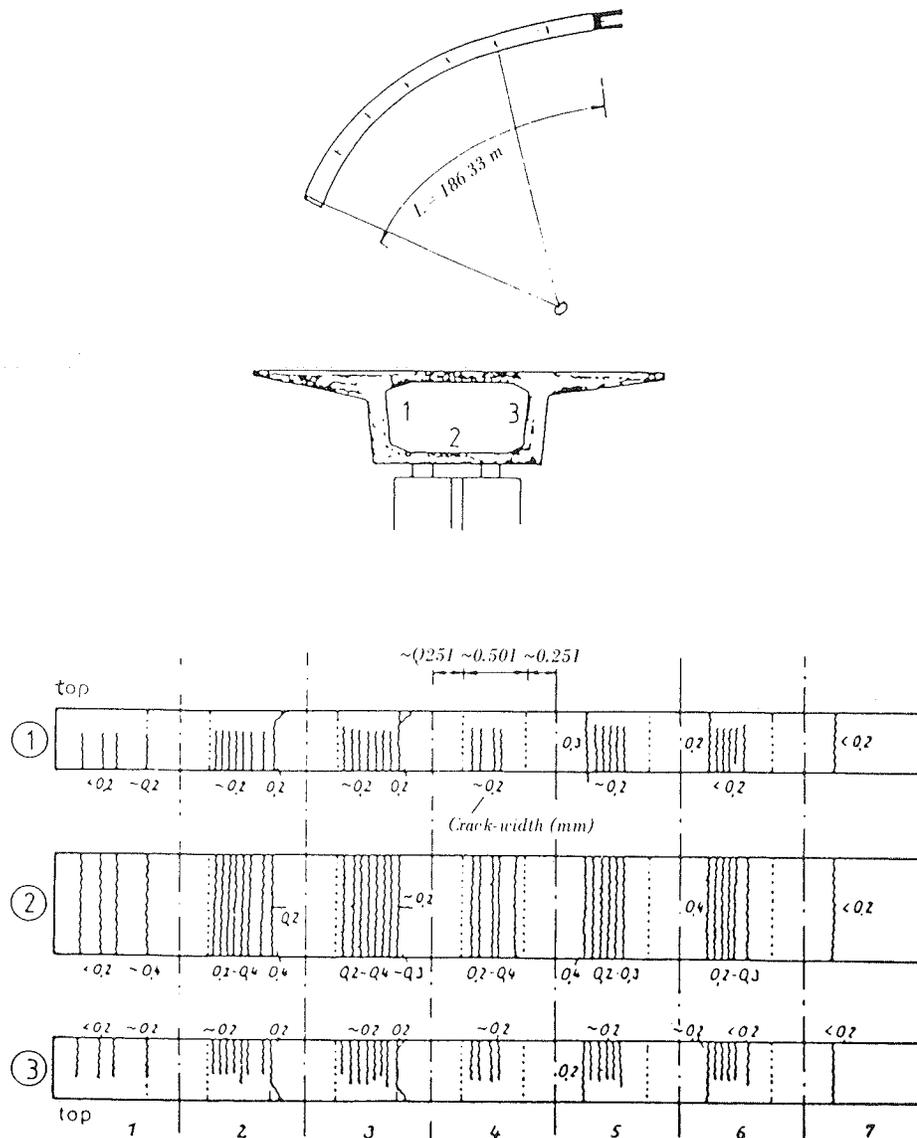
Cracks in a multispan box-girder bridge.
